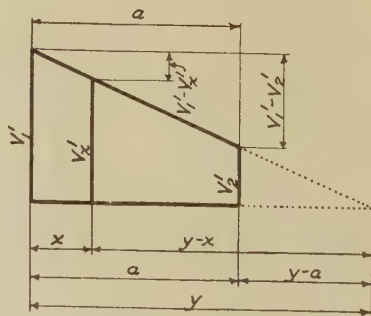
STIRRUP SPACING FOR CASE I (ENLARGED FROM FIG. 9).
